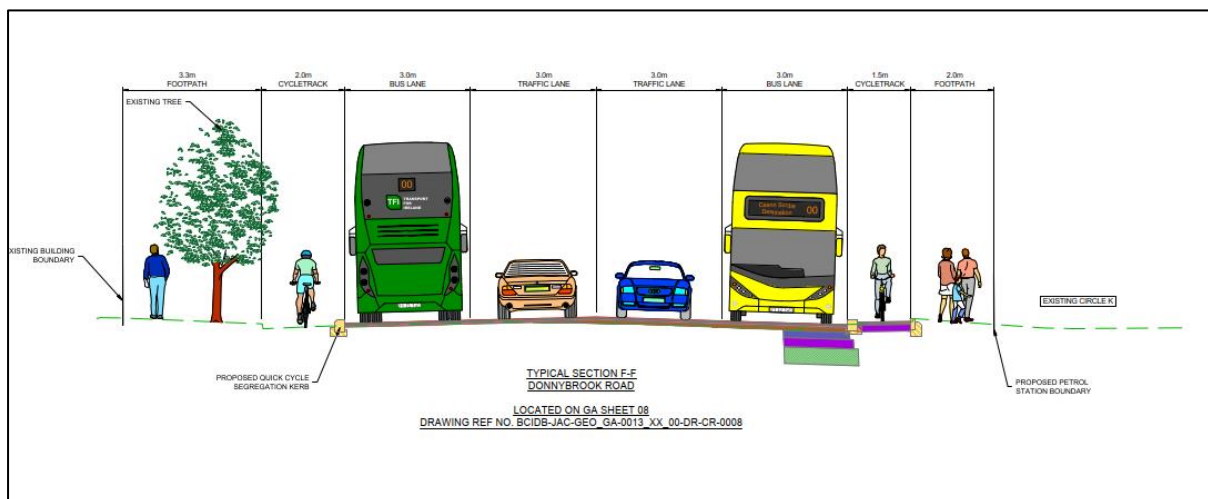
Extract from Typical Cross-section Drawing (Sheet 04)
